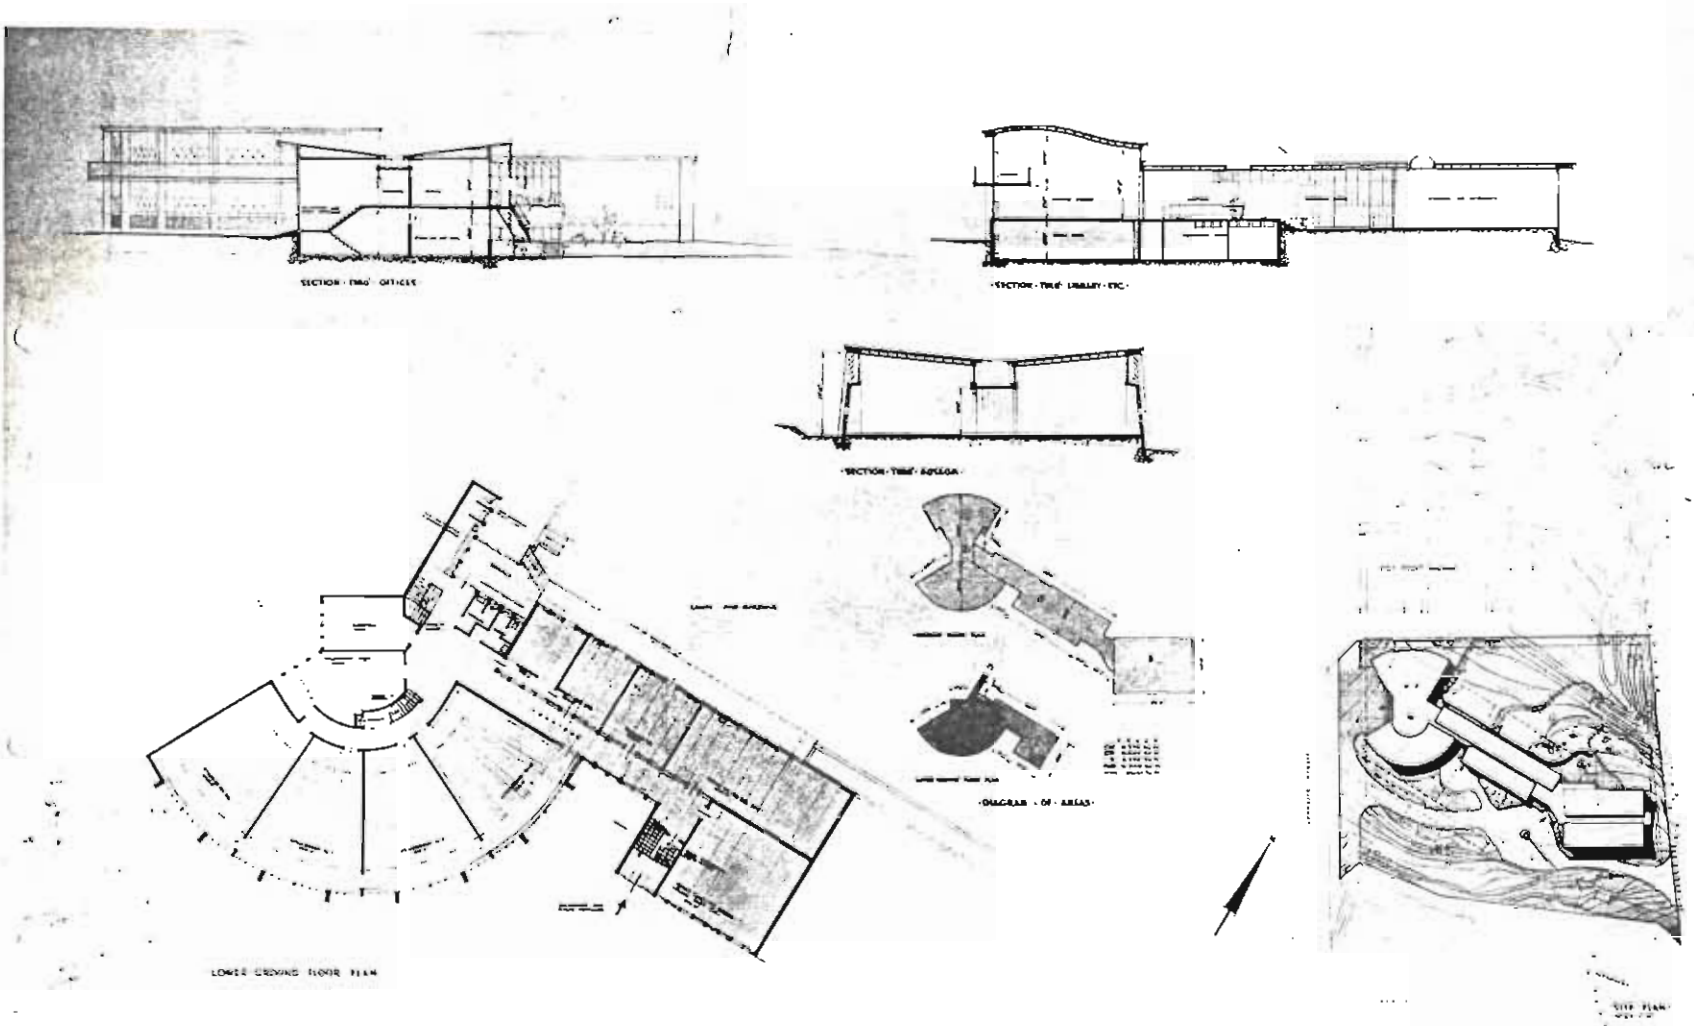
Windhoek Library, Archives and Museum; site plan, plan, section.
